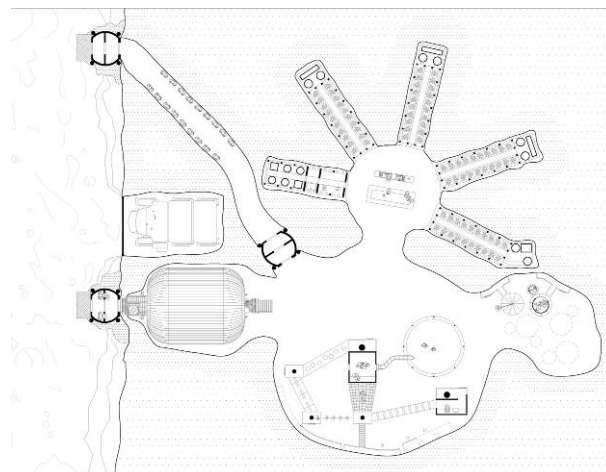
Plan showing the preliminary modules and its expansion. (credit: HB2, TU Wien, Design Studio Moon Village, Meulli, Mion, Redl, 2018)
